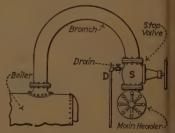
Steam connection equipped with single ordinary stop valve.
